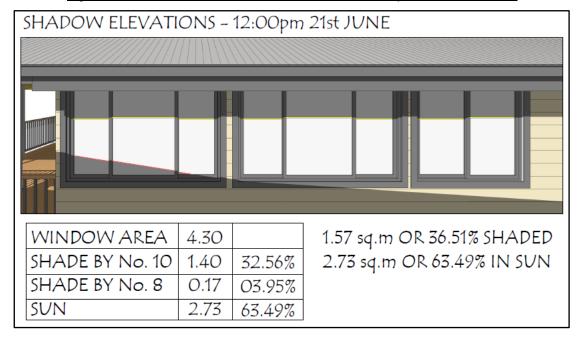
Revised shadow elevations for 10 Admiralty Crescent at 12:00 noon
